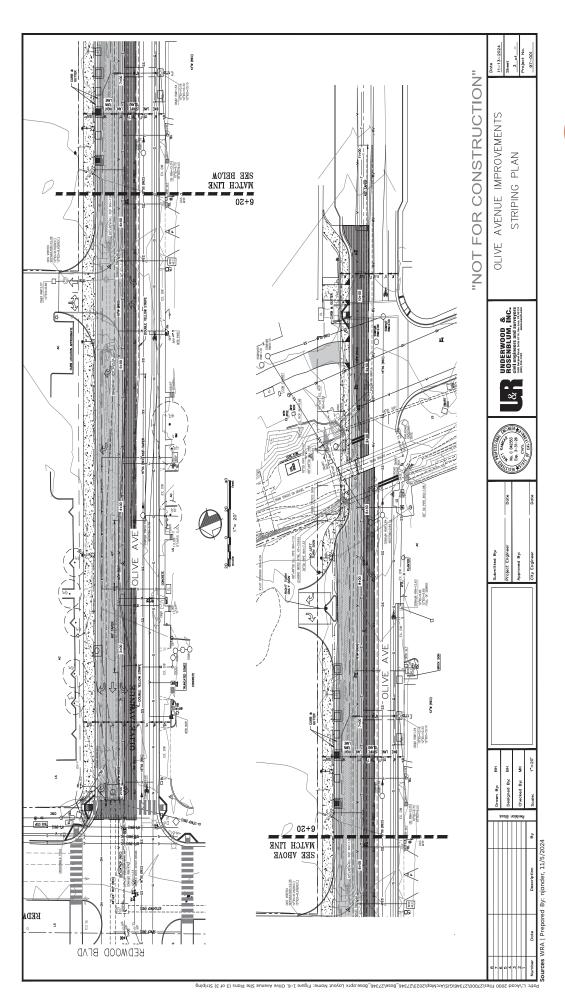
Olive Avenue Site Plans (3 of 3) Striping
